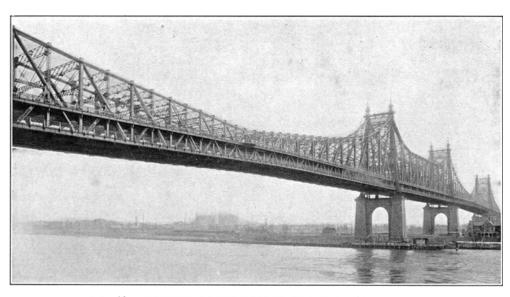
QUEENSBOROUGH BRIDGE FROM MANHATTAN.
